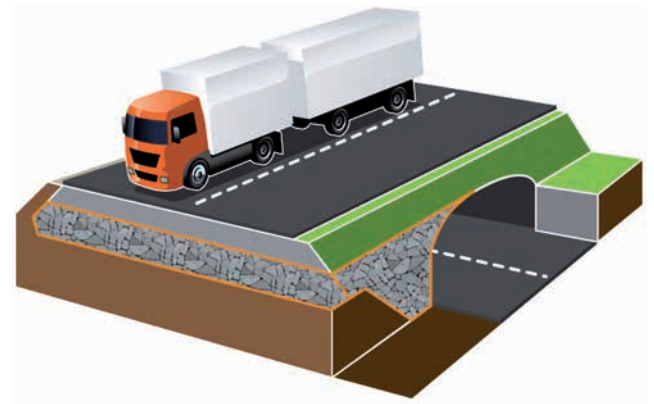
Foamed glass used in an embankment and for the bulk lightening of foundations for a bridge.
